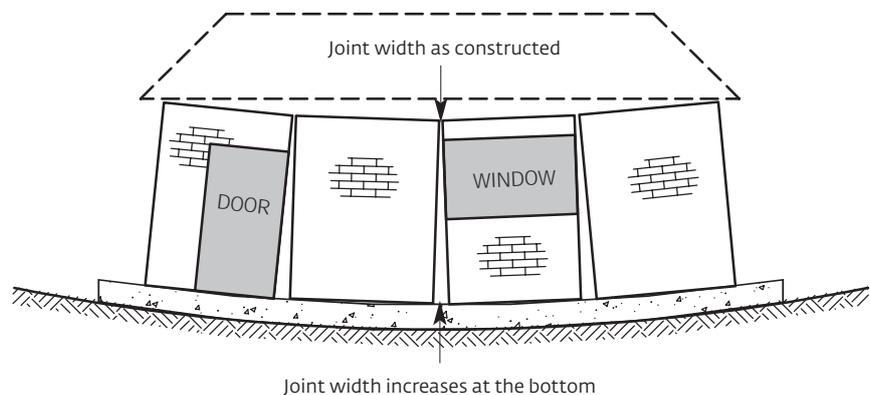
Effect of foundation movement on articulated walls (dishing foundation)
